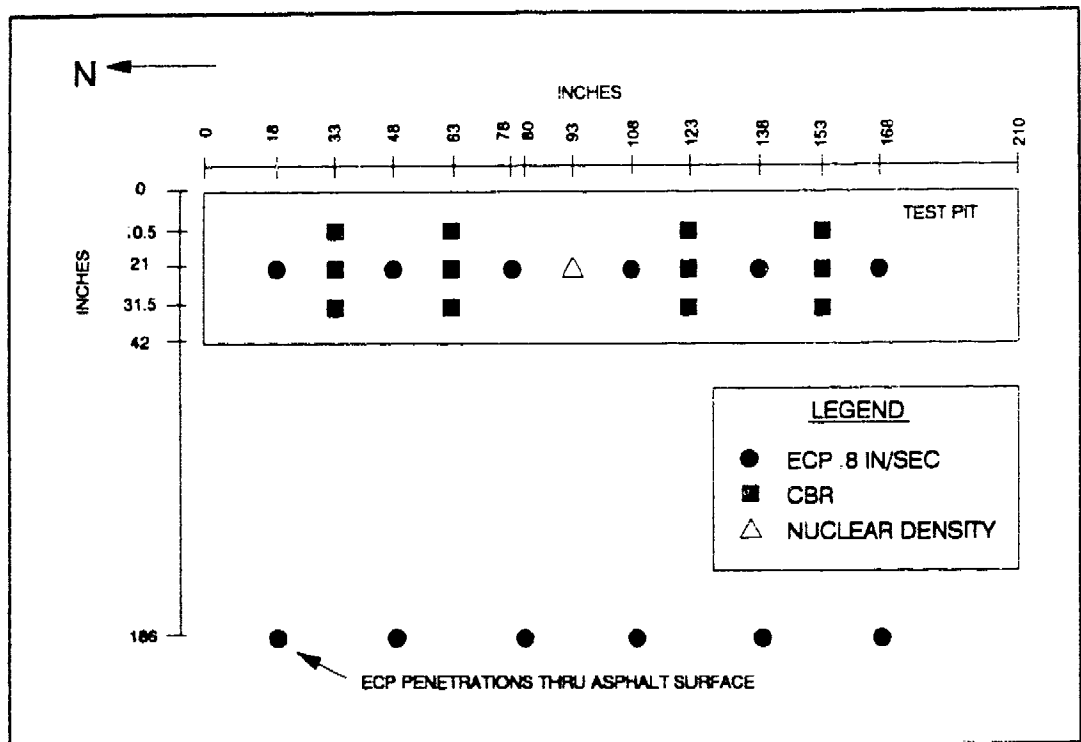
Typical plan view of test pits, Maxwell AFB, AL
